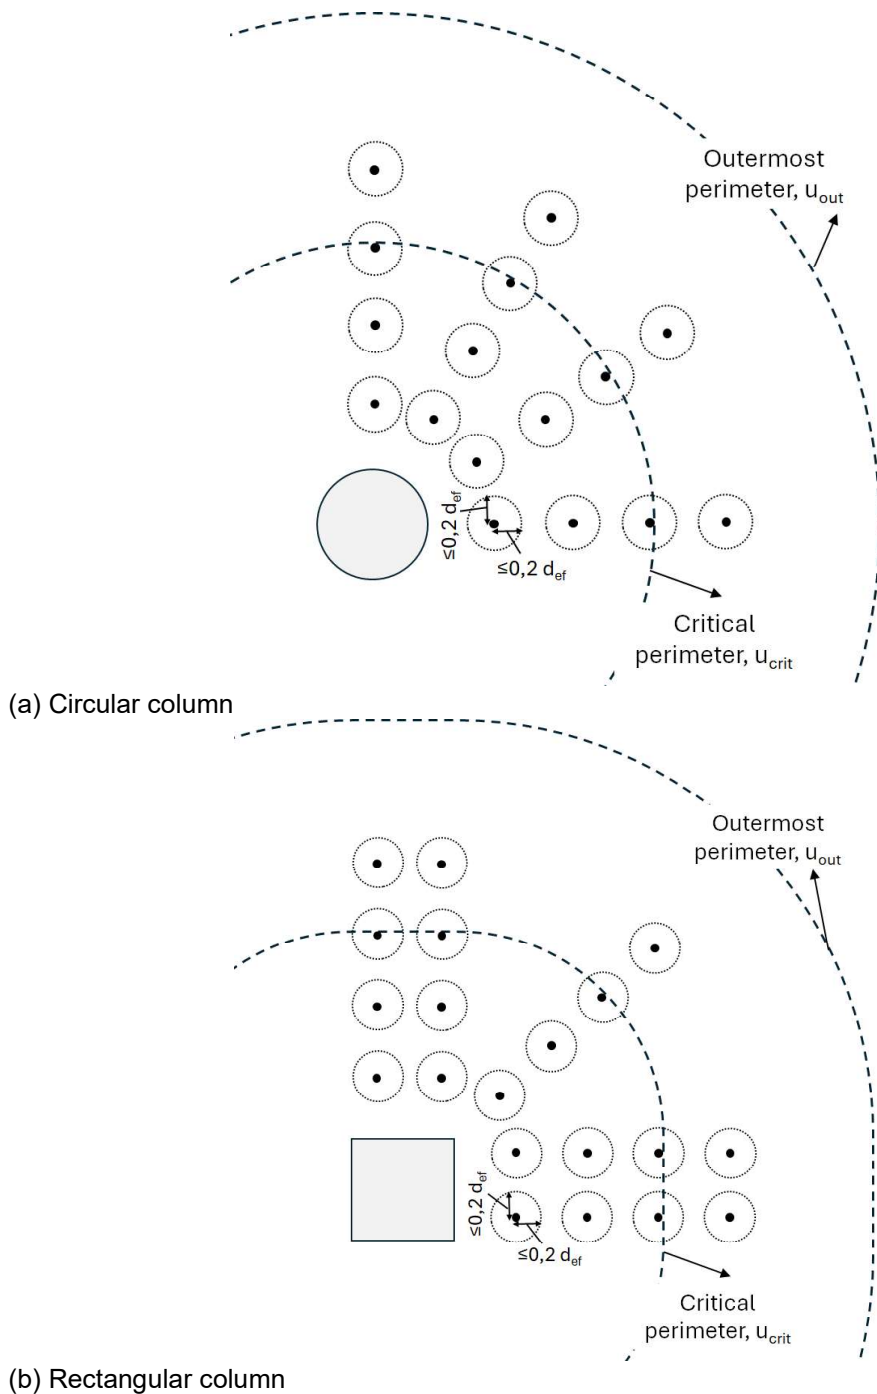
Permissible installation tolerances in case a reinforcement is intersected: (a) Circular column, and (b) Rectangular column.
